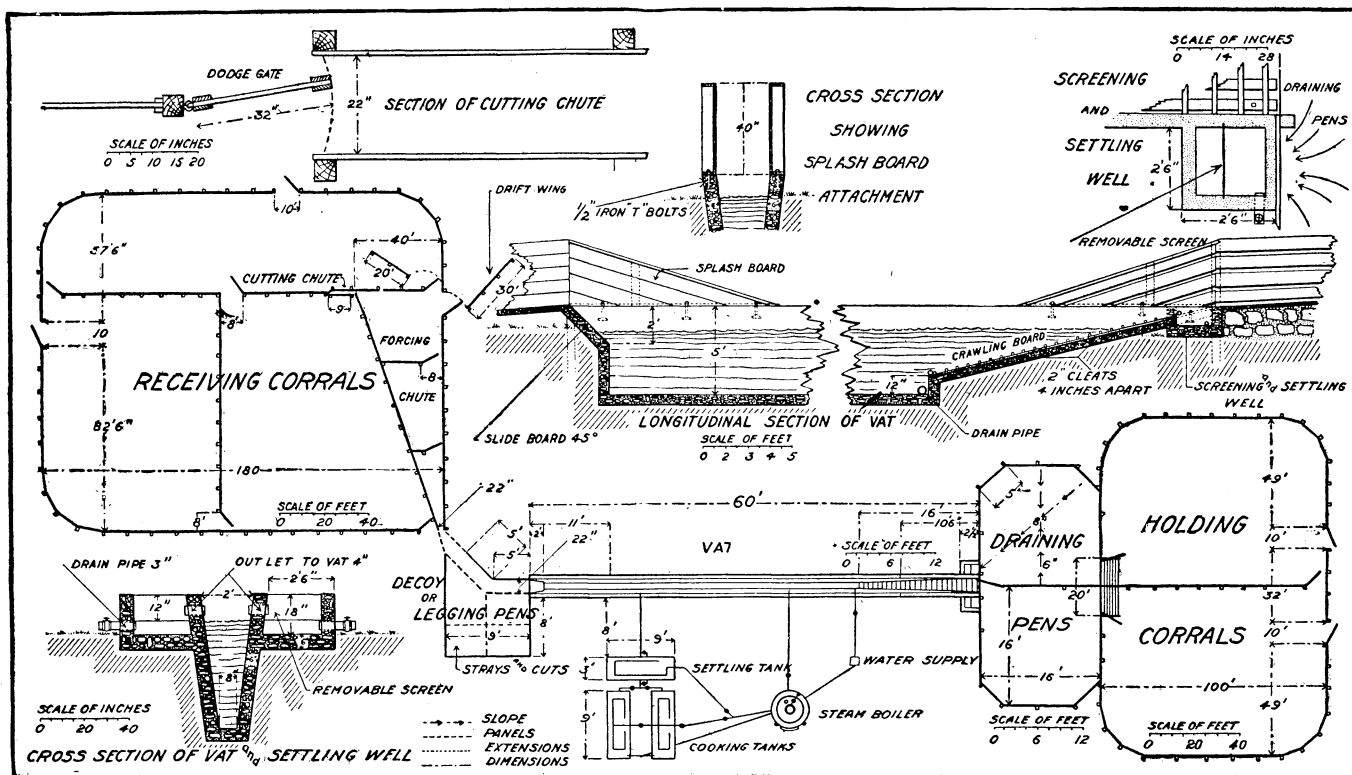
Plan of sheep-dipping plant; wooden vat.
